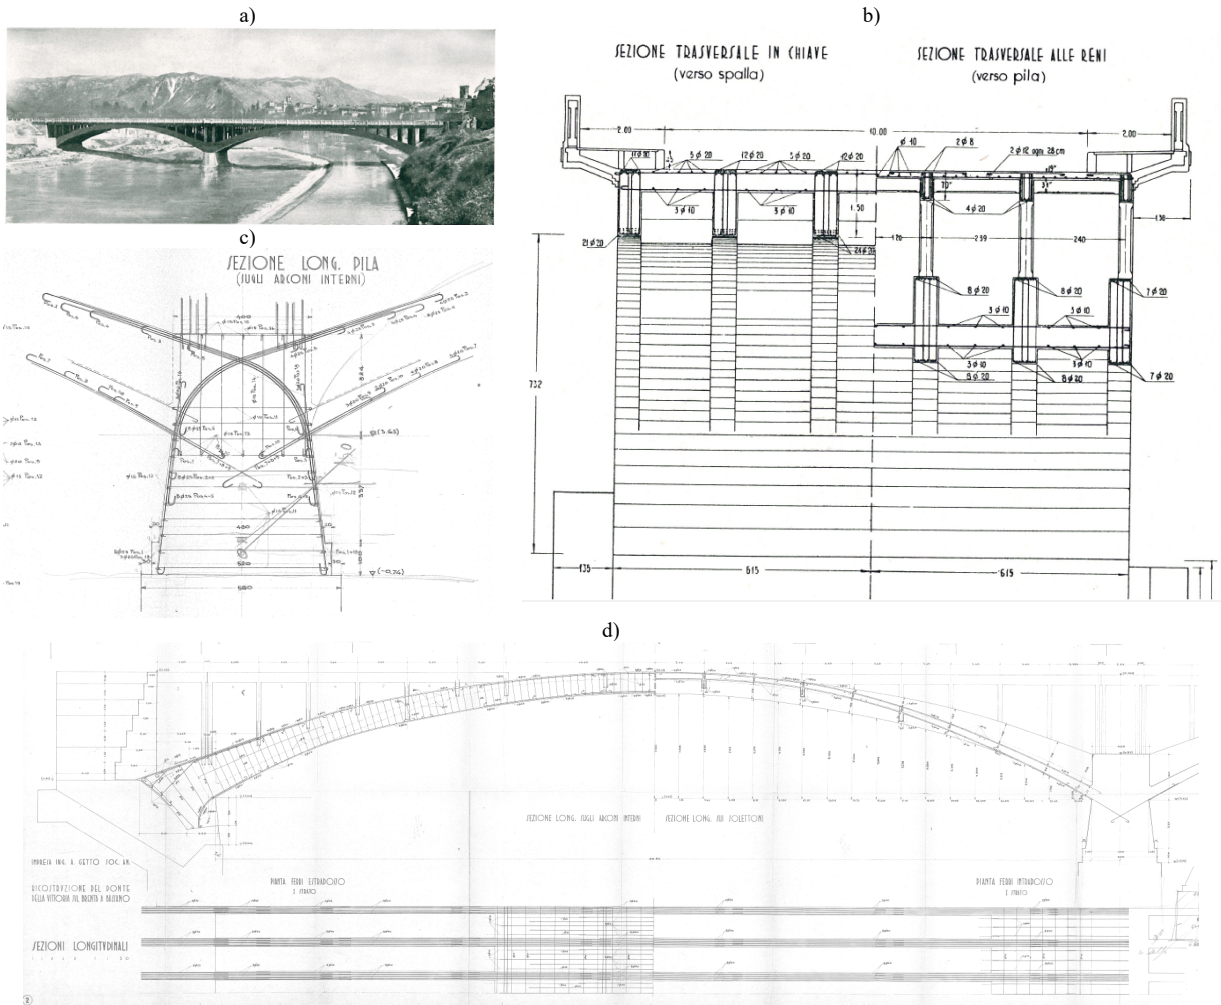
Two-span RC arch bridge case study (a) and original drawings with reinforcement detailing of the deck (b), pier (c) and arches (d) (from Ufficio del Genio Civile di Vicenza 1948).
